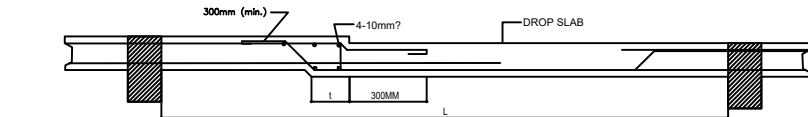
TYPICAL DETAIL OF DROP SLAB
